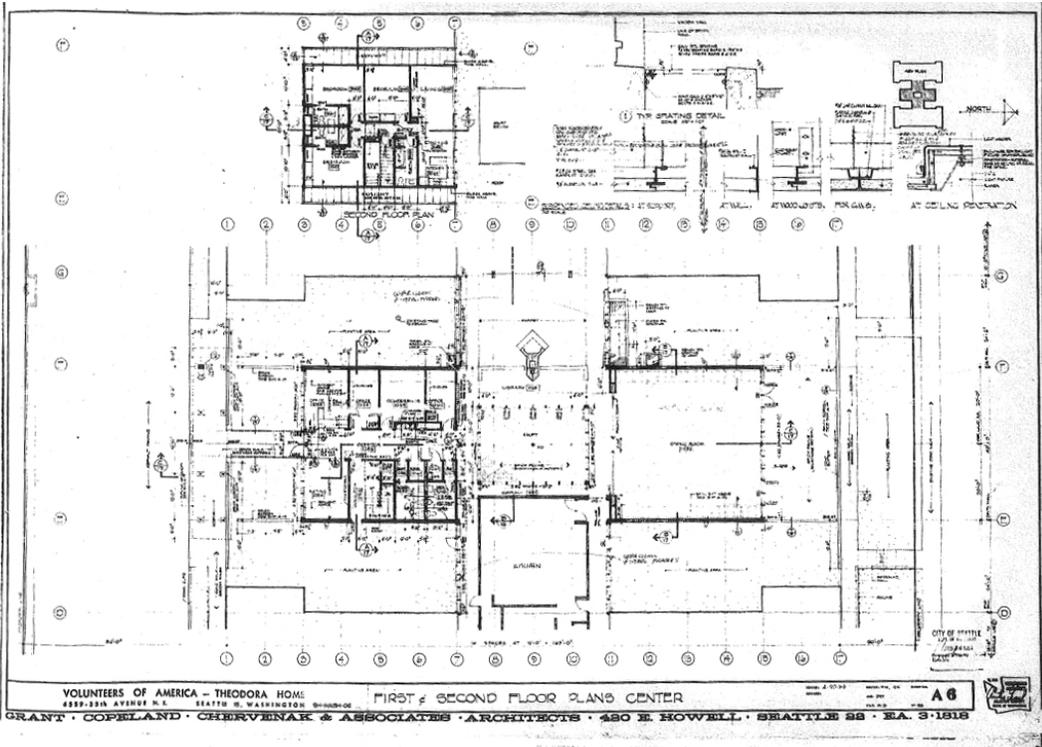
Original First Floor Plan Center (Seattle Department of Planning and Development archives)
